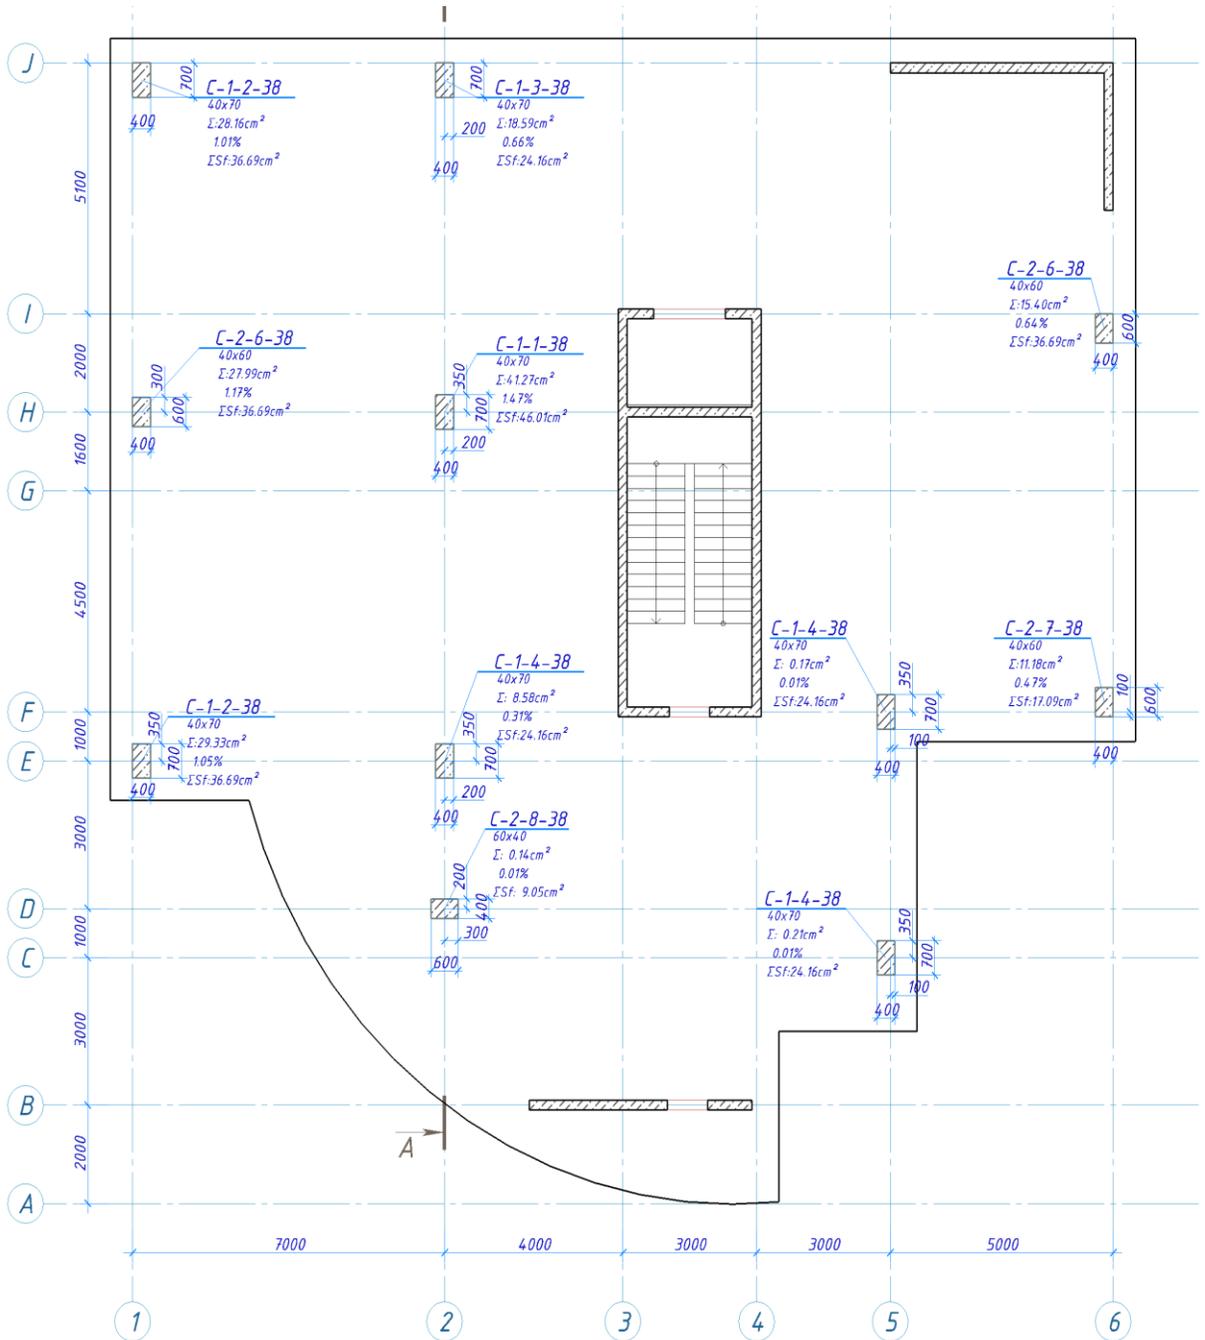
Plan of the first storey with column tags, column dimensions and snap from columns to grid lines
